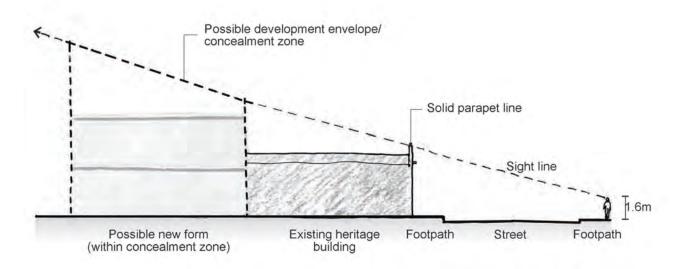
Across the street sightline for single storey residential or commercial buildings with a front parapet.
